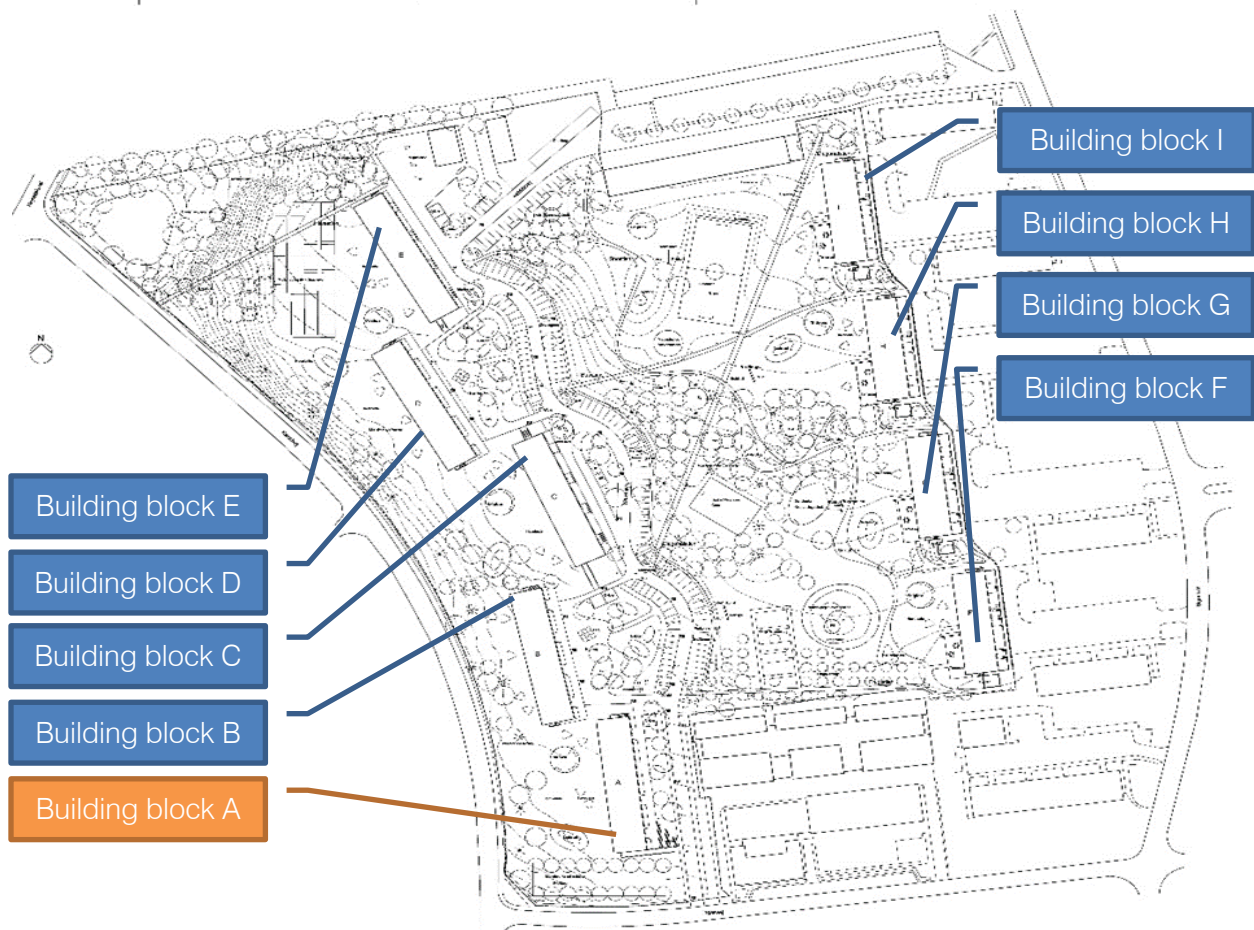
Site plan of Section 3 of Skovgårdsparken (social housing project) including nine building blocks (A-I) [Note: a small selection of the as-built drawings for building block 'A' have been provided in Appendix 3]
